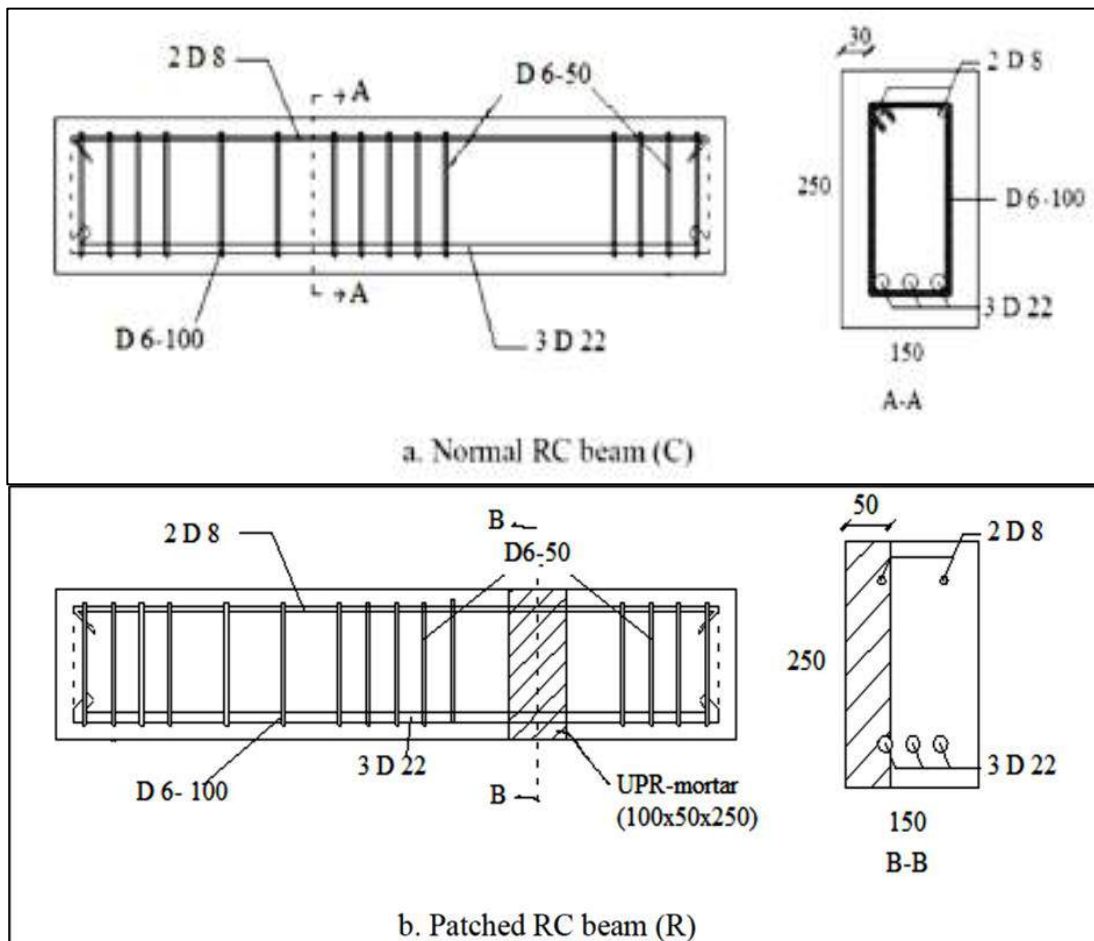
(a) Reinforcements layout and cross section of C and R beam; (b) Reinforcements layout and cross section of C and R beam [42].
